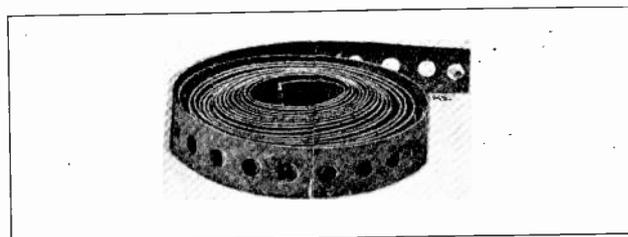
Copper grounding strip of the type shown above is often used to ground conduit systems to the waterpipes or earth grounds.
